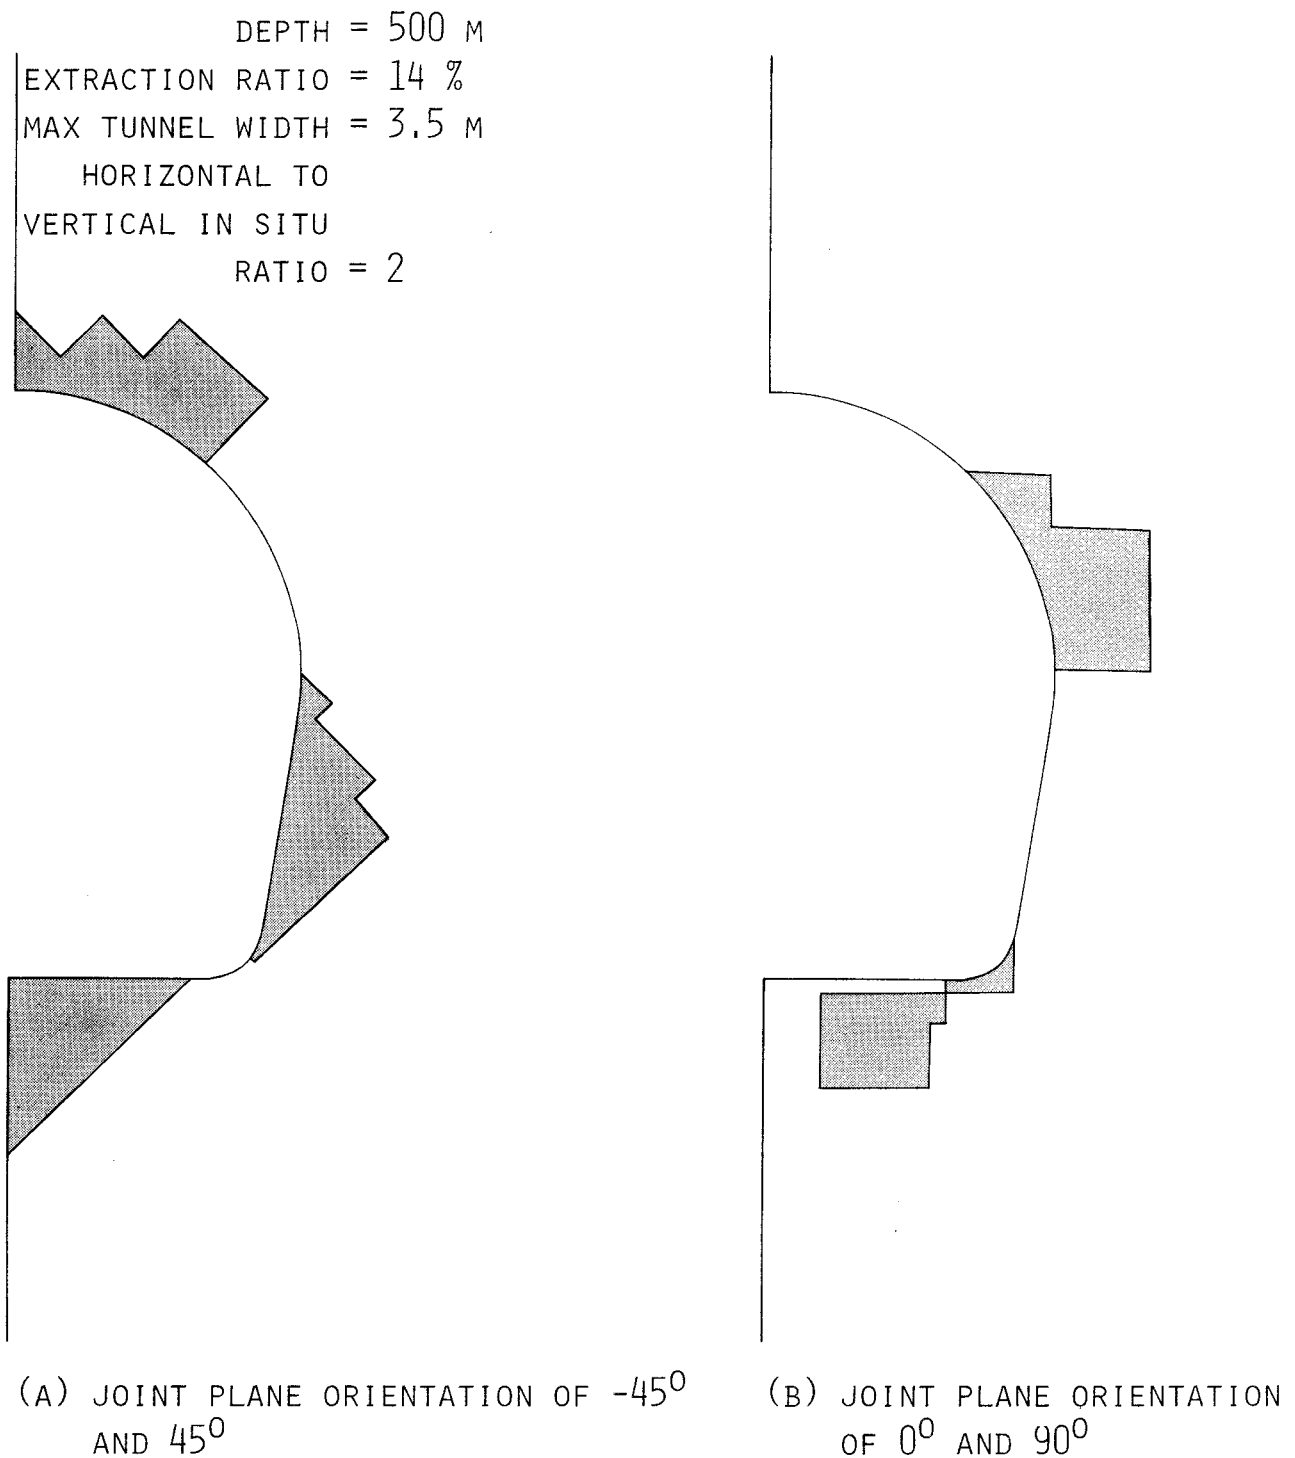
FAILED REGIONS AROUND A STORAGE TUNNEL PRIOR TO WASTE EMPLACEMENT.
